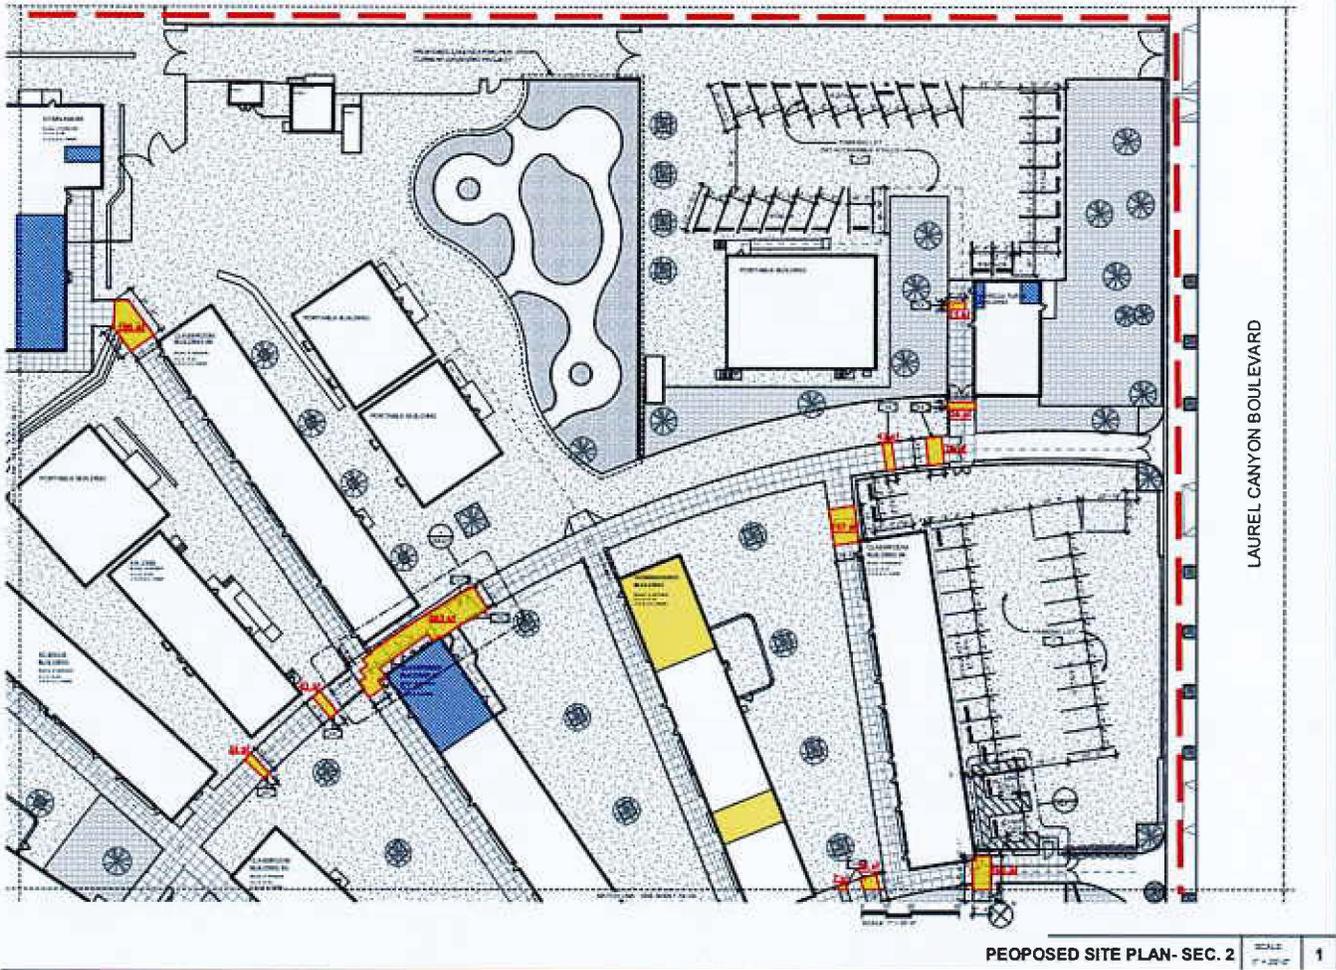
Proposed Site Plan: Laurel Canyon Boulevard (North Side of Campus)
